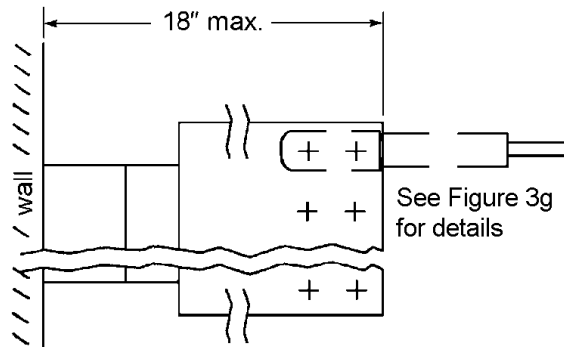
Bus Bars Parallel to Floor, Elevation View (Cables Parallel to Floor)
